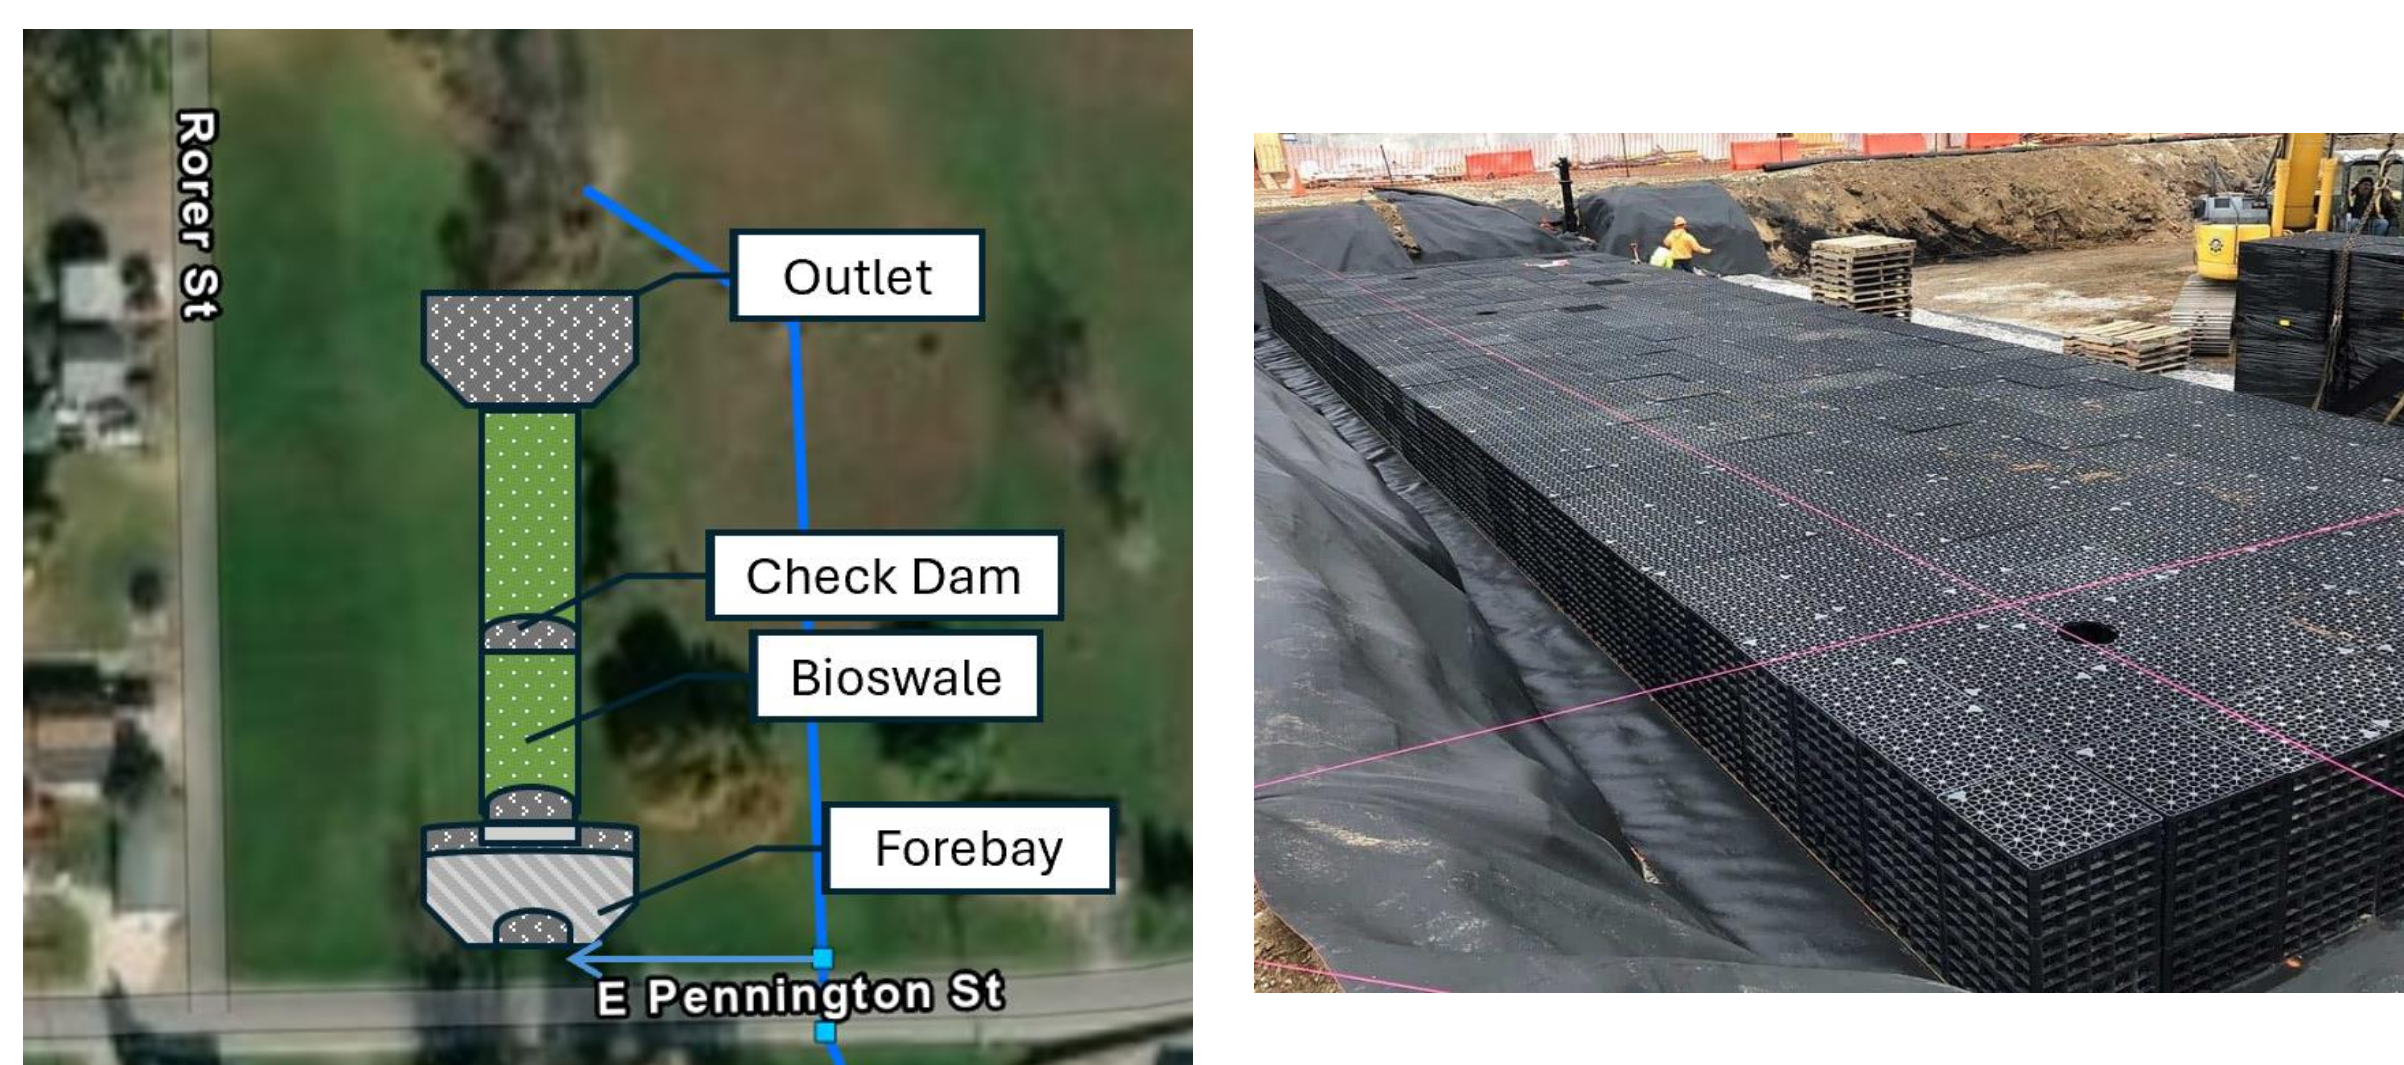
Luers Park bioswale (left) and underground storage tank, R-tank (right).
